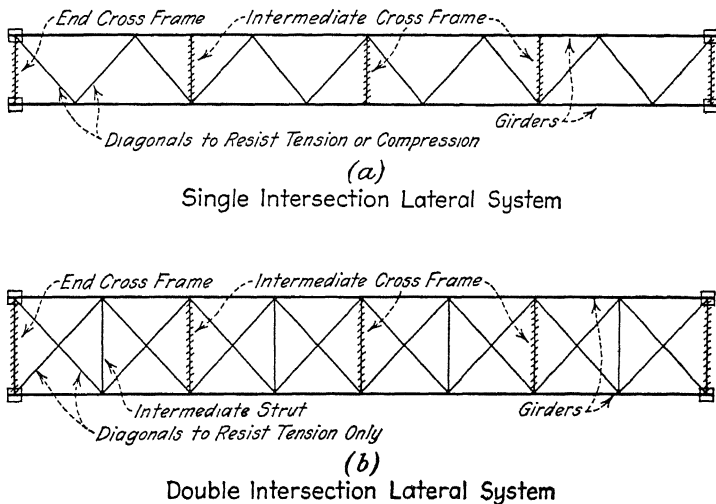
Types of Lateral Bracing for Deck Girder Bridge.
